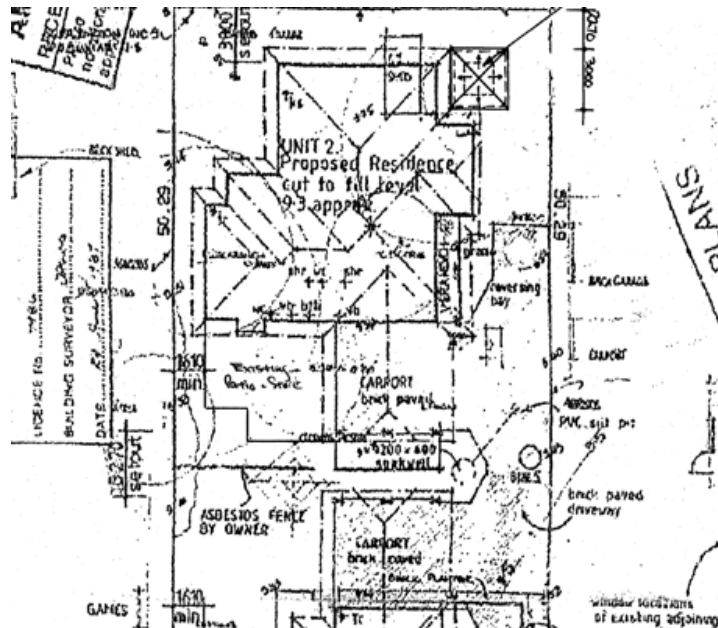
Plan of Adjoining Western Property Confirming That Subject Boundary Wall abuts an Adjoining Carport
